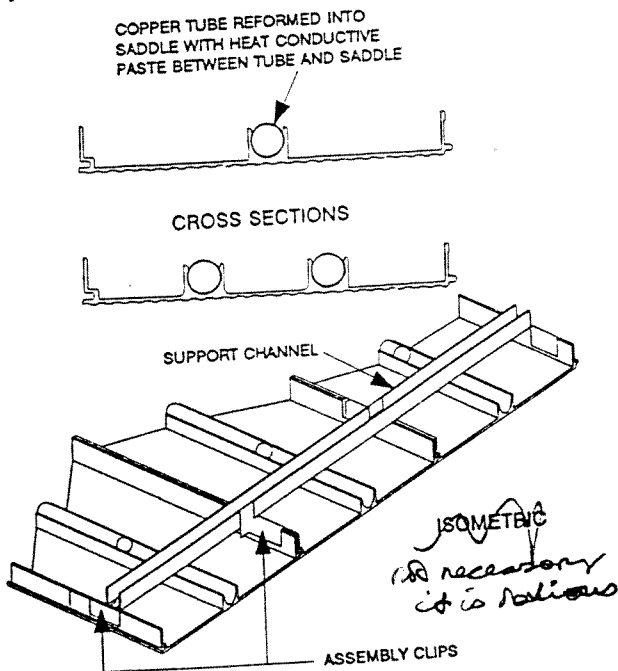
Extruded Aluminum Panels with Integral Copper Tube
